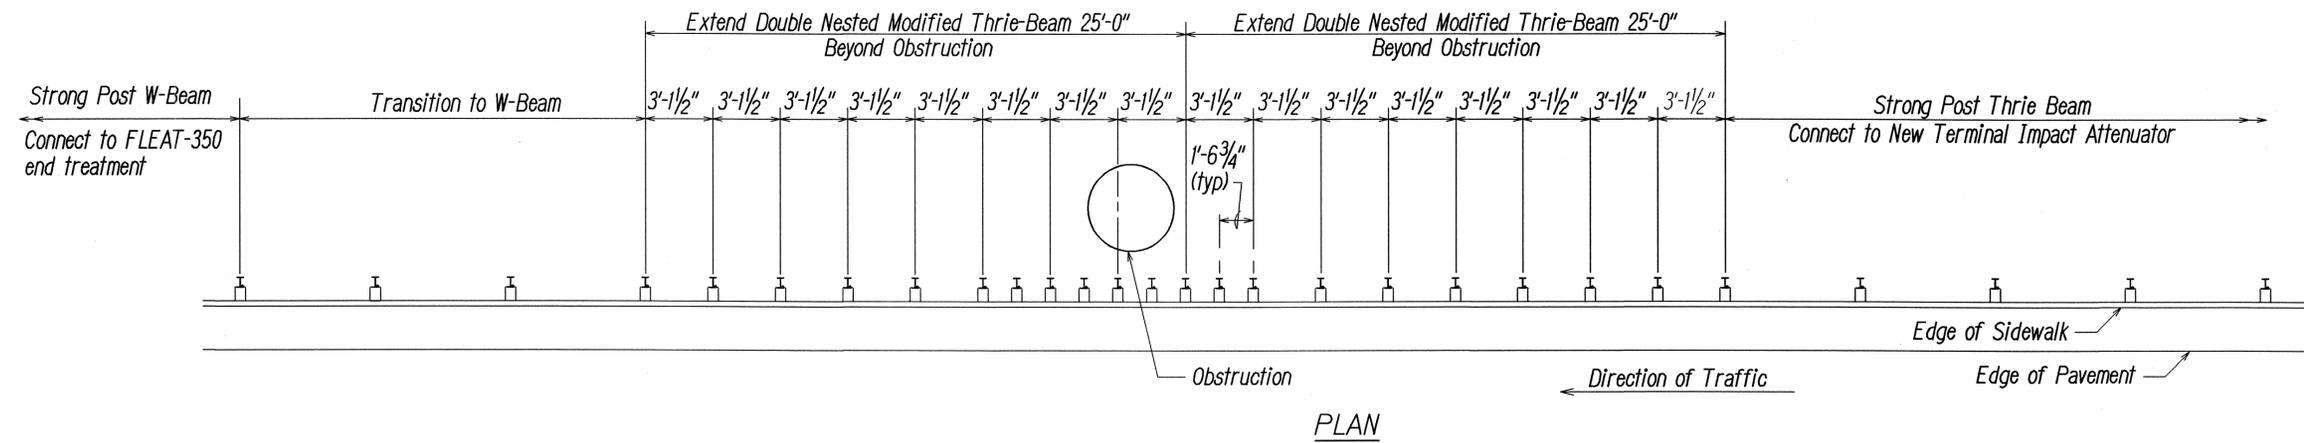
DETAIL OF GUARDRAIL INSTALLATION AT OBSTRUCTION
